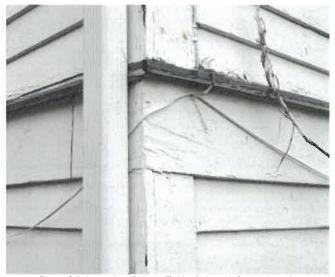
Lap siding, Water Table, Belt and Corner boards,
